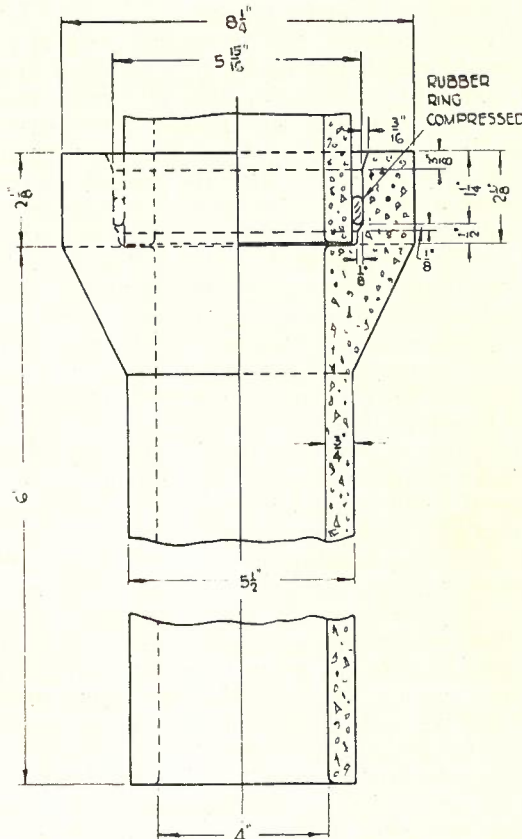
Reinforced Concrete Pipe, Rubber Ring Joint.
